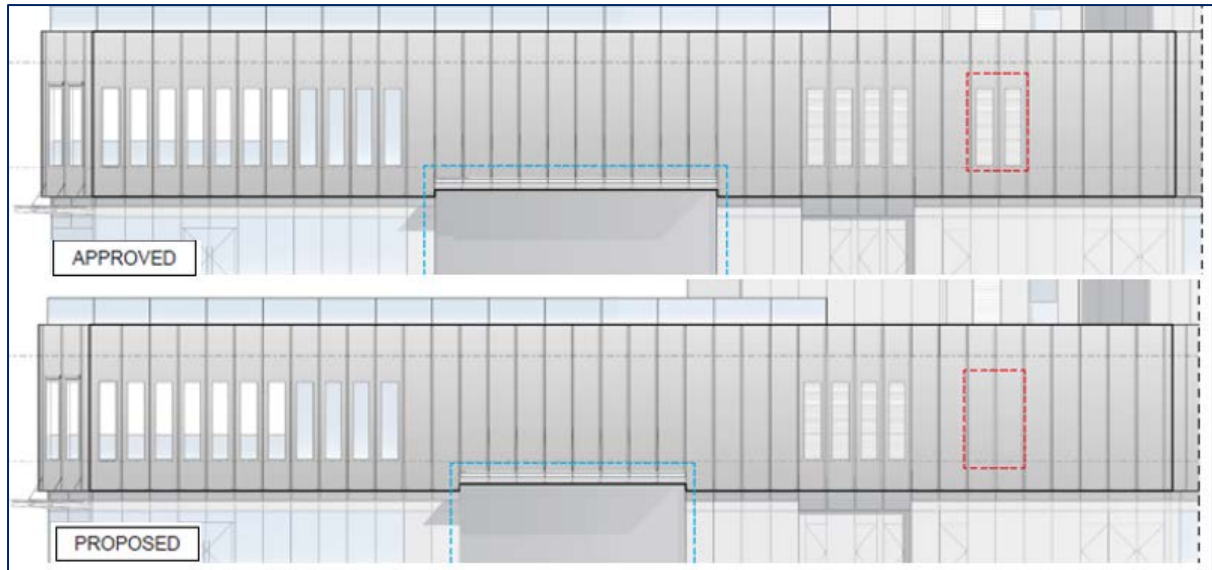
| Amended louvres to southern podium façade (Source Applicant's Design Report)
